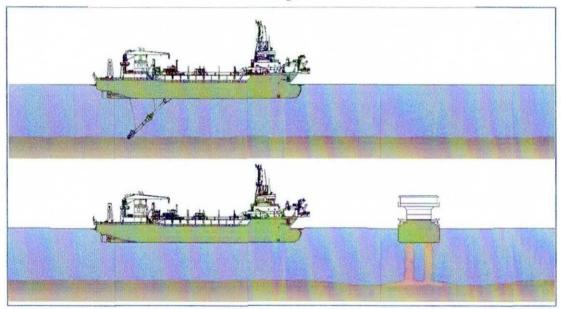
Typical Sub-Sea Trench Construction with TSHD
